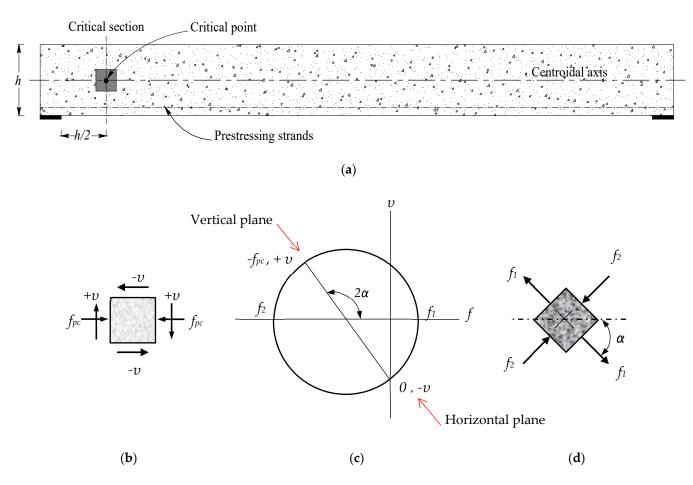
Stress state in an element near the support. (a) HCS elevation, (b) element stresses; (c) Mohr's stress circle, and (d) element principal stresses.
